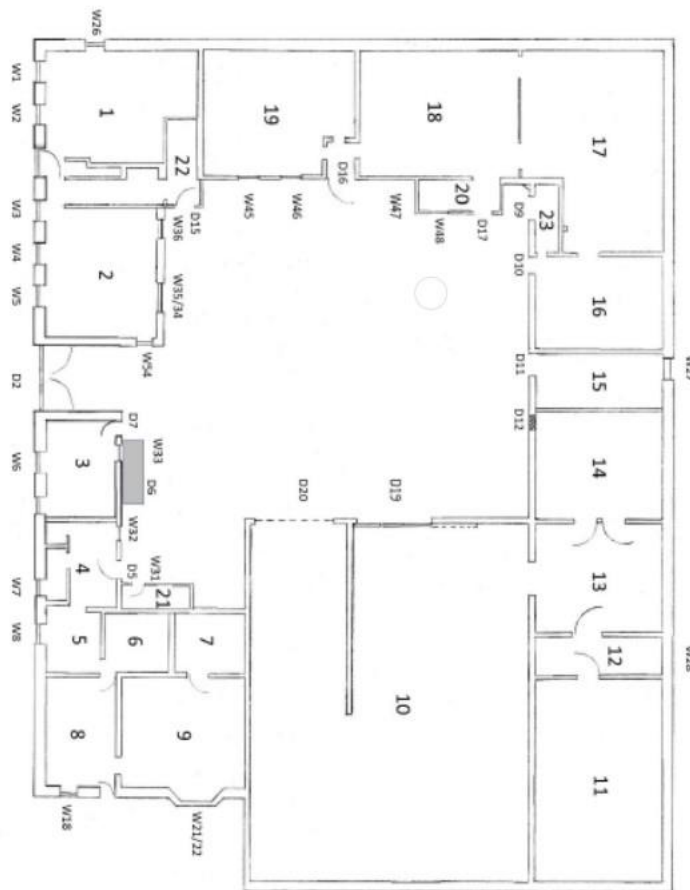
Existing Ground Floor Plan (courtesy of Robert Lenfert Archaeology)
